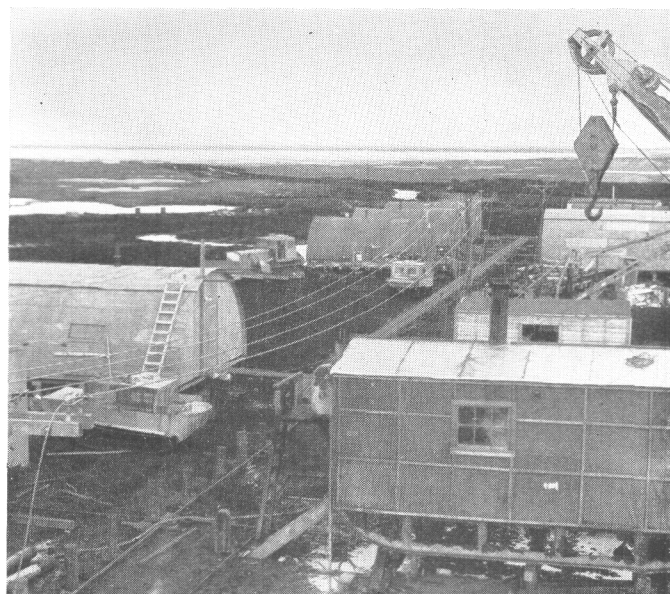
Camp at South Barrow test well 3. Photograph by U. S. Navy, 30 June 1949.
